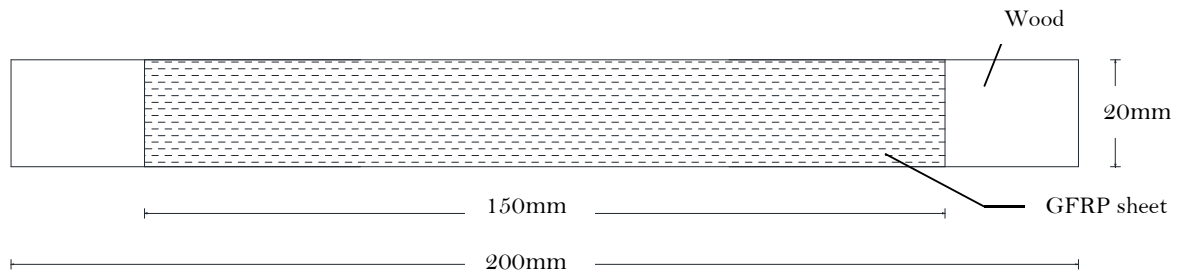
Bottom view of a GFRP reinforced wood beam
